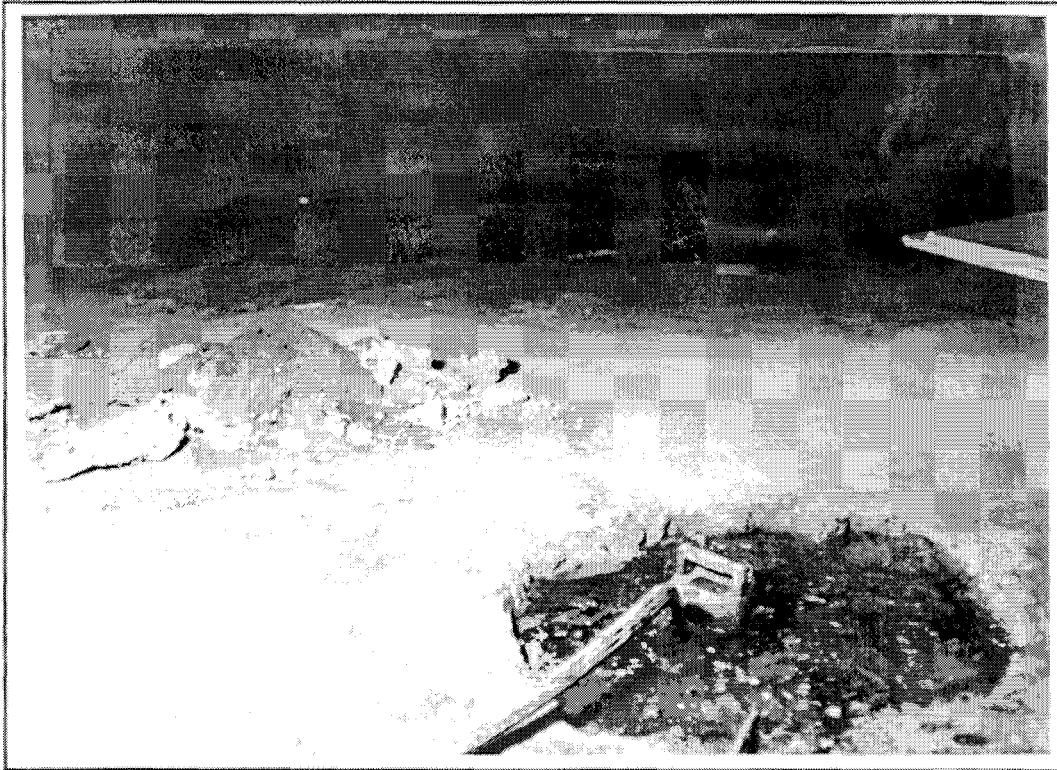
Temporary Sump in Crawl Space Floor for Flood Relief
